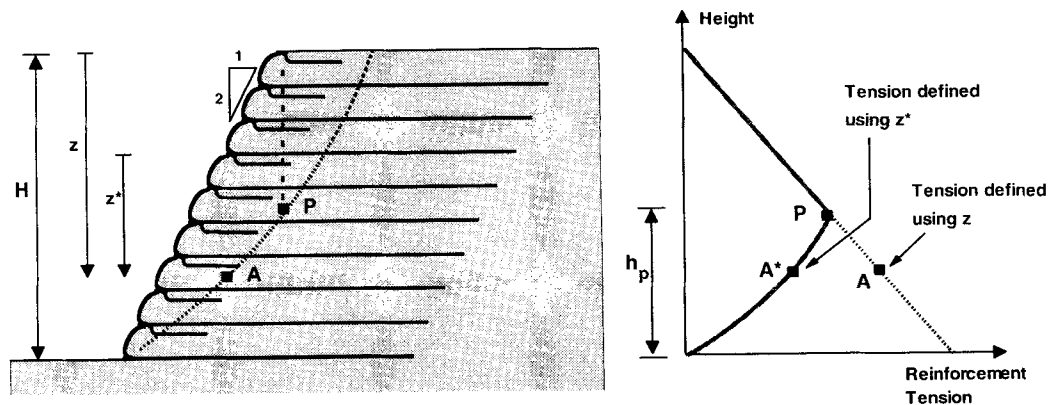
Distribution with Depth of Maximum Reinforcement Tension for Reinforced Soil Slopes under Working Stresses (z and z^* Are, Respectively, Vertical Distances from Crest and from Slope Face to Generic Point A along Potential Failure Surface)
